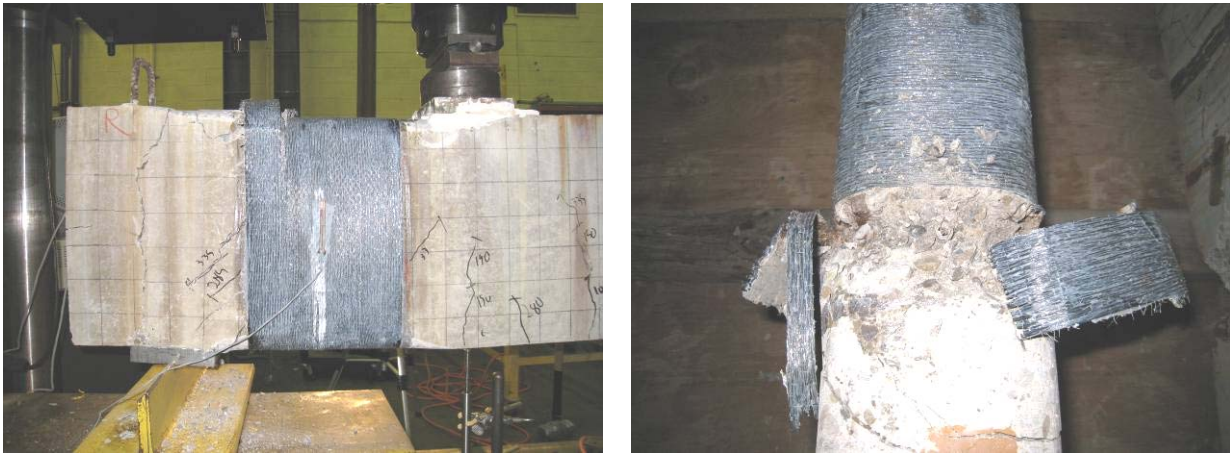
Crack Pattern at Failure and Crushing under CFRP Specimen H-1.5-Repair
